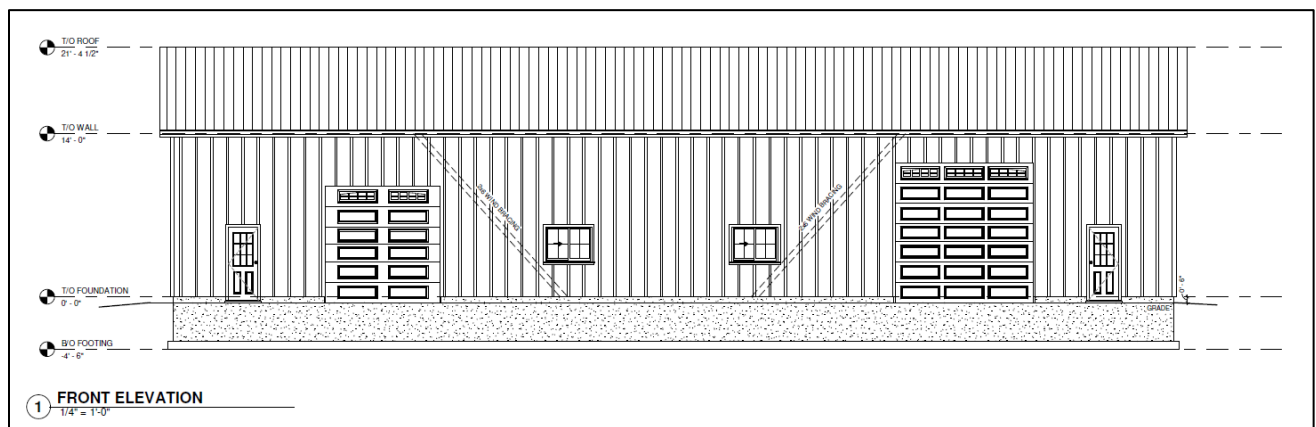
Elevation of the proposed accessory structure by Ontario OutBuilding.
